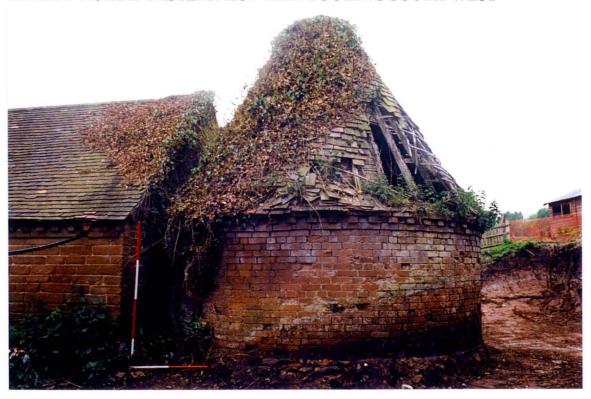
NORTHERN ELEVATION OF BARN AND HOP KILN
